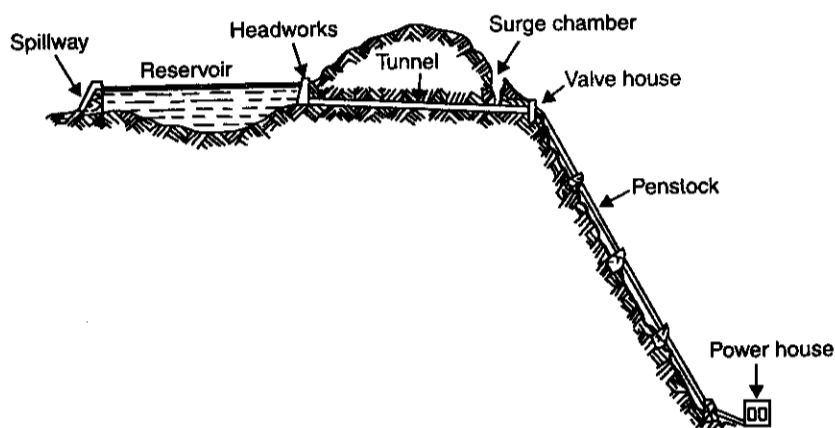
High head power plant layout. The main dam, spillway, and powerhouse stand at widely separated locations. Water flows from the reservoir through a tunnel and penstock to the turbines.
